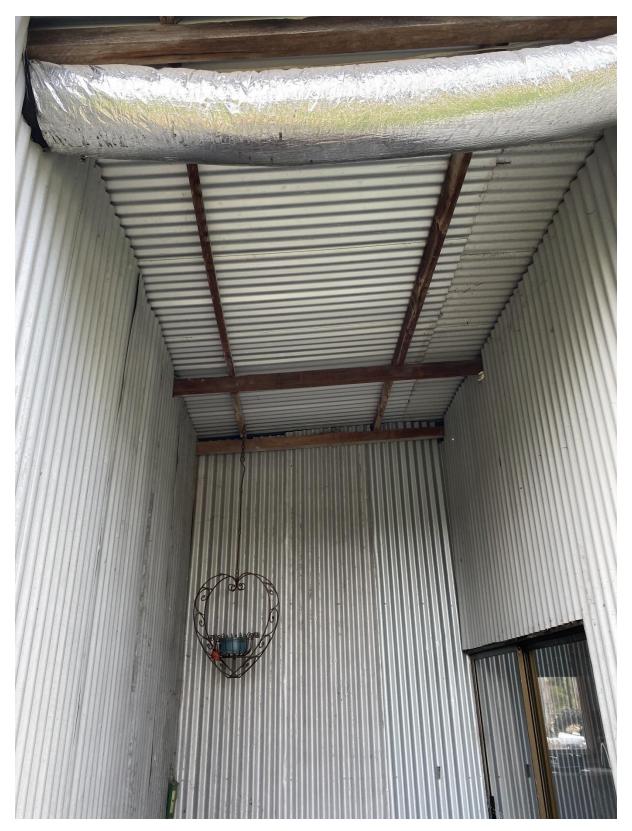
North elevation west end of shed structure which is converted to habitable living space.
